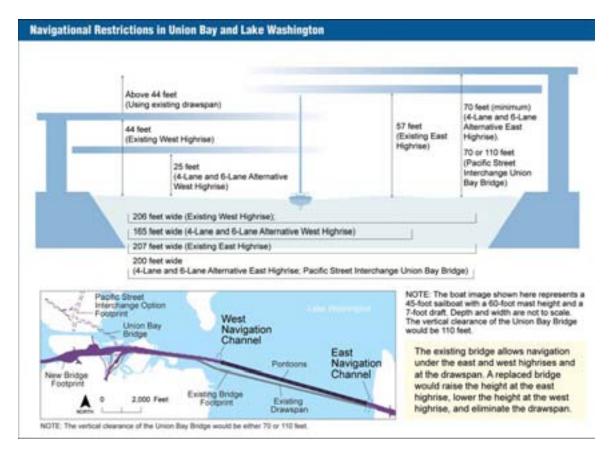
Navigational Restrictions in Union Bay and Lake Washington
